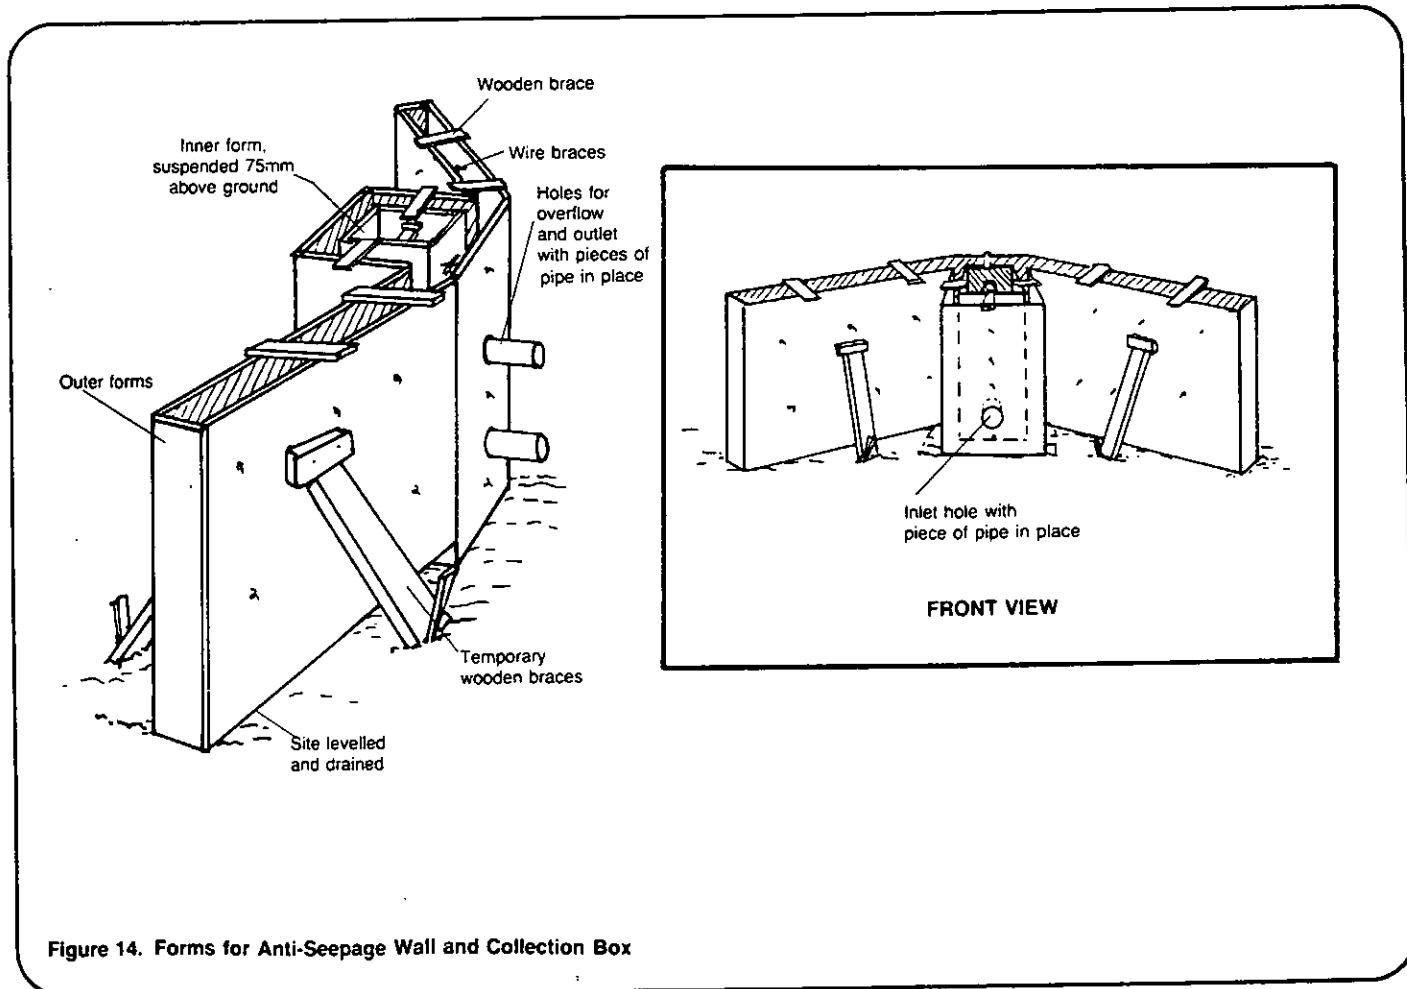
Forms for Anti-Seepage Wall and Collection Box
